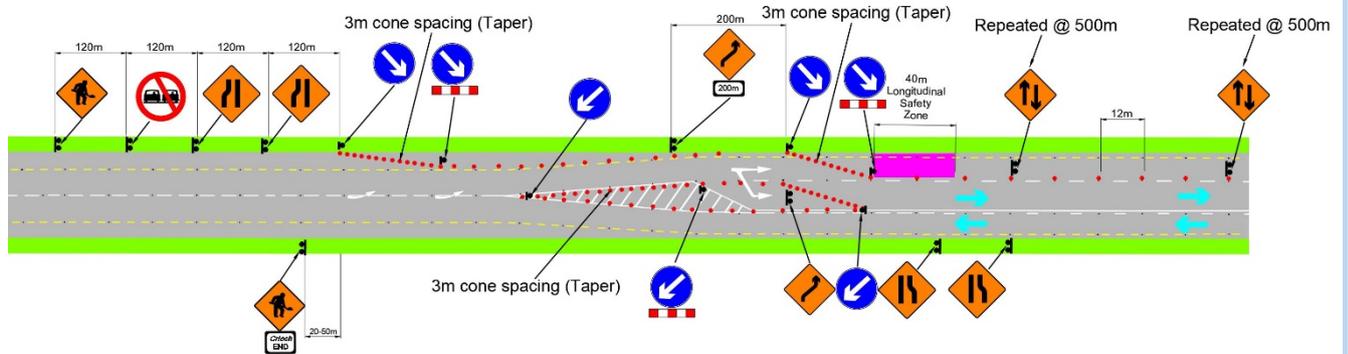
Typical Overtaking Lane Layout (Lane 1 Closure) with works at start
